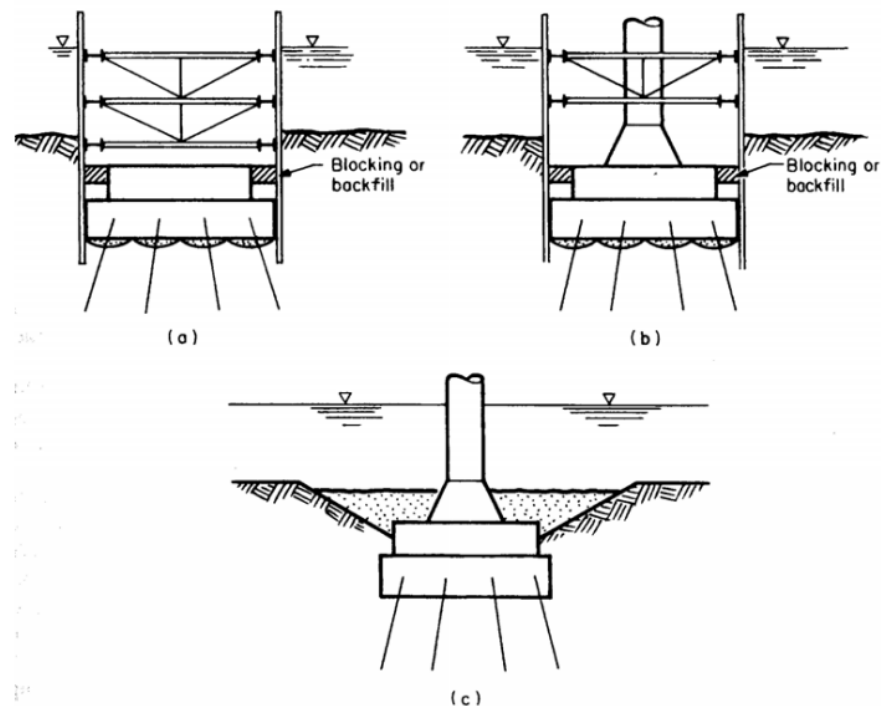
D: Cofferdam construction details. (a). Check blocking, dewater, construct footing block, block between footing and sheet piles. (b) Remove lower bracing, construct pier pedestal, construct pier shaft. (c) Flood cofferdam, pull sheets, remove bracing, backfill. Source: UW Department of Construction Management (2007).
